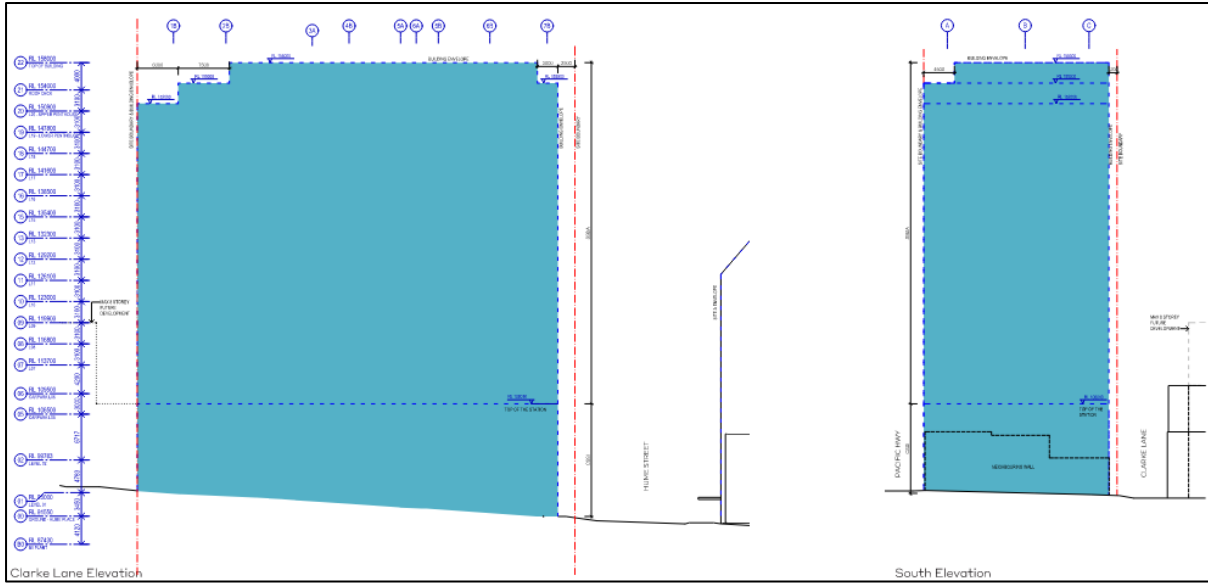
Approved Building Envelope Clarke Lane and South Elevations (Source: Woods Bagot, 2024)
